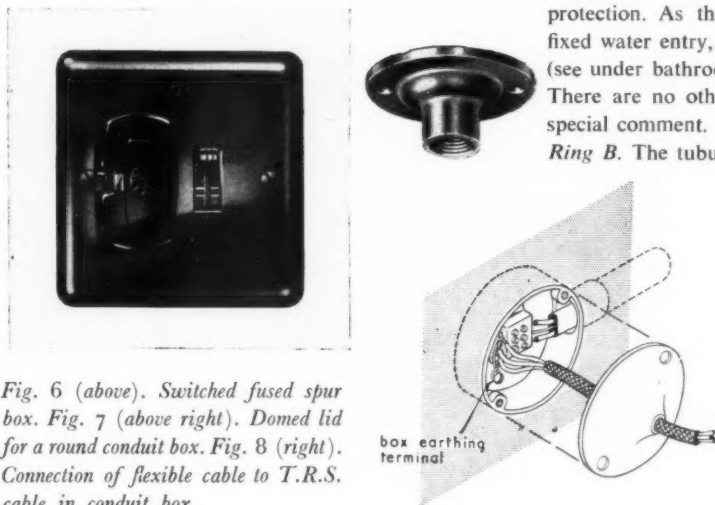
(above). Switched fused spur box. Fig. 7 (above right). Domed lid for a round conduit box. Fig. 8 (right). Connection of flexible cable to T.R.S. cable in conduit box.
